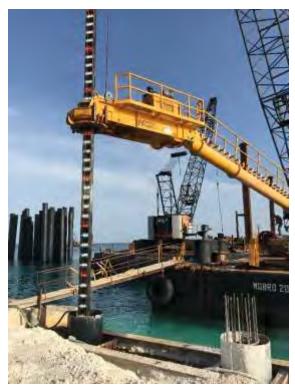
Crane-Mounted Hain's Drill for drilling rock sockets below pile tip elevation.
